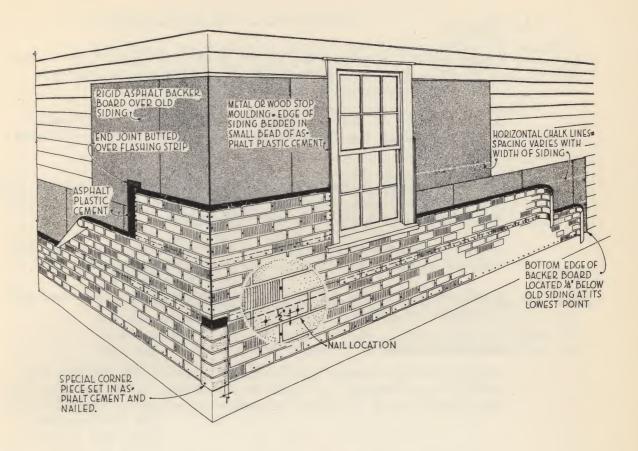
Application of Asphalt Roll Brick Siding - corner, trim, end joint, and nailing details.
